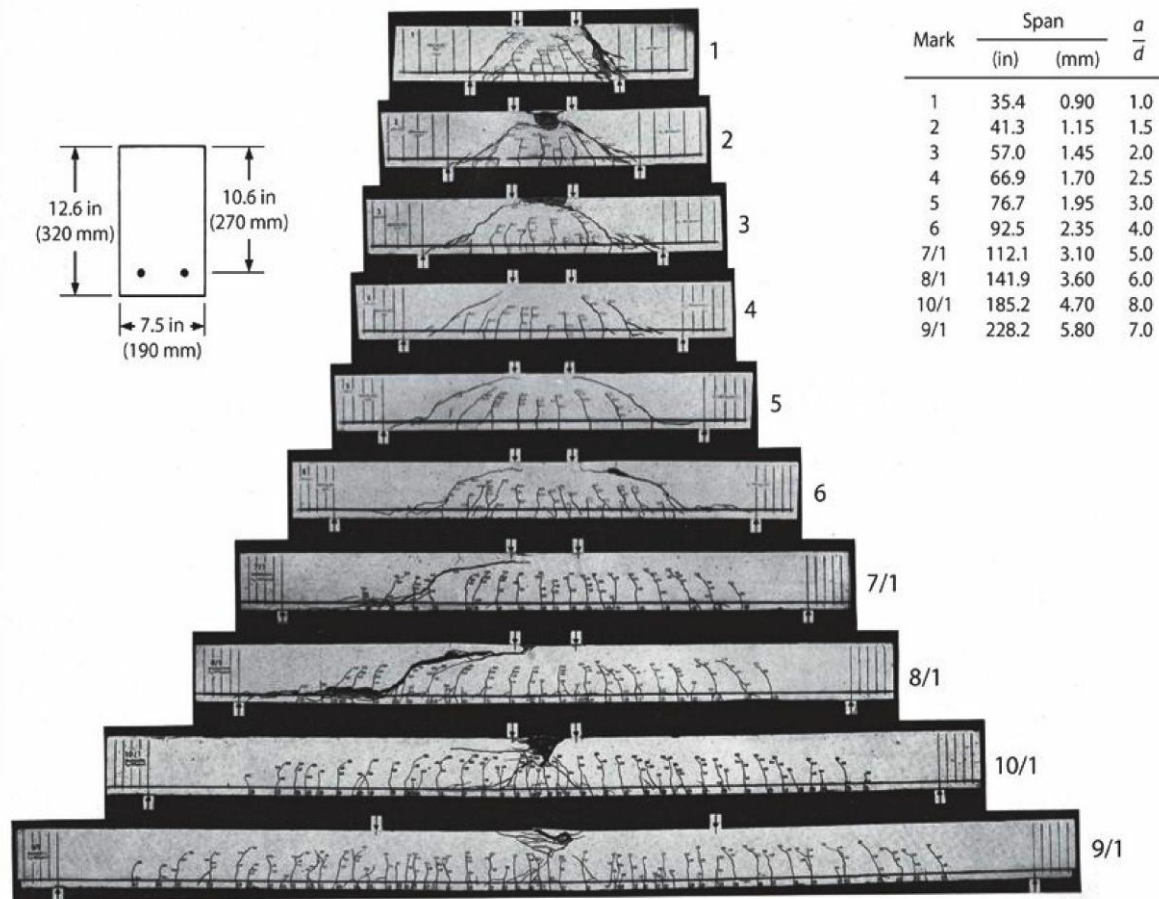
Damage at failure in series of tests on beams without transverse reinforcement. (After Leonhardt, 1962.)
